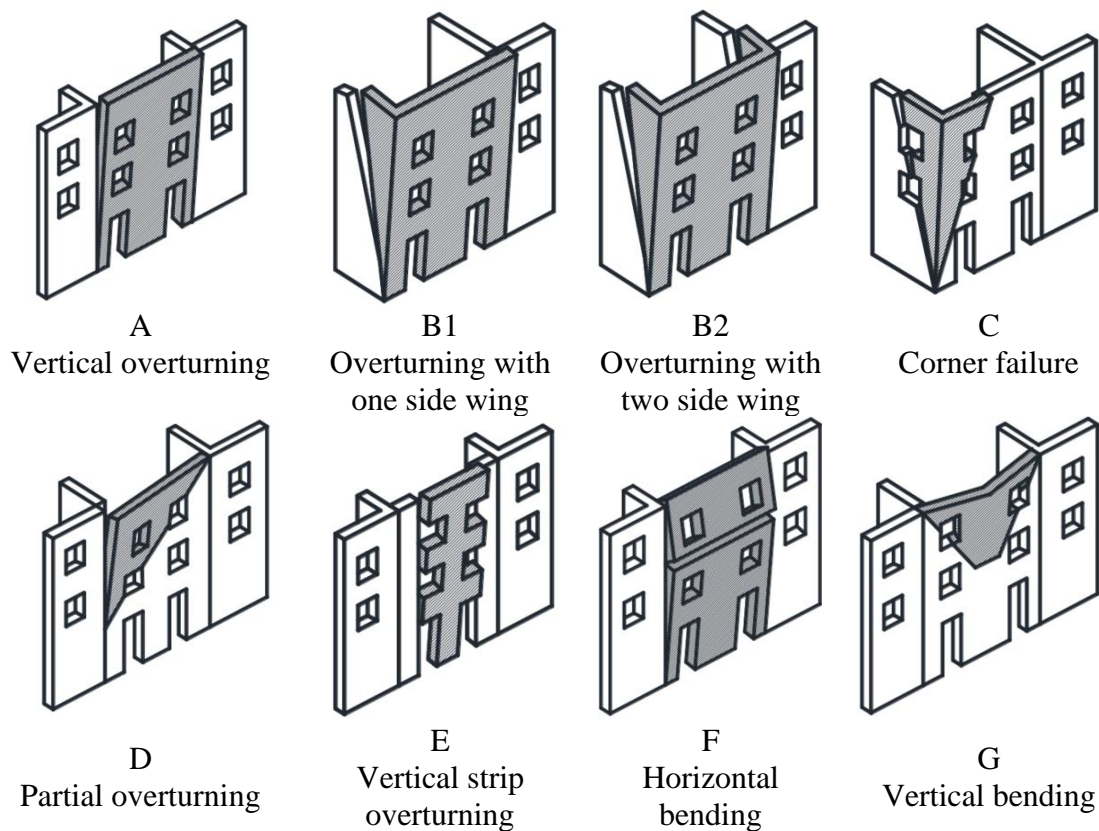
Typical out-of-plane collapse mechanisms for historic masonry buildings [101]
